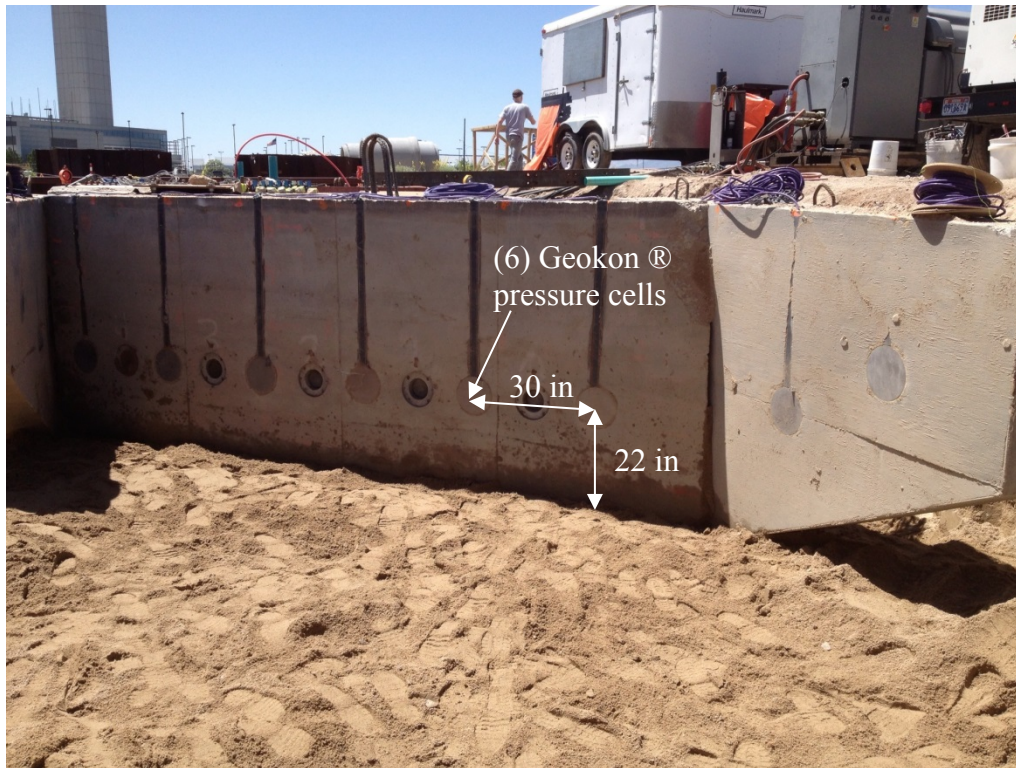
Pressure cell layout for 45° skewed abutment backwall.
